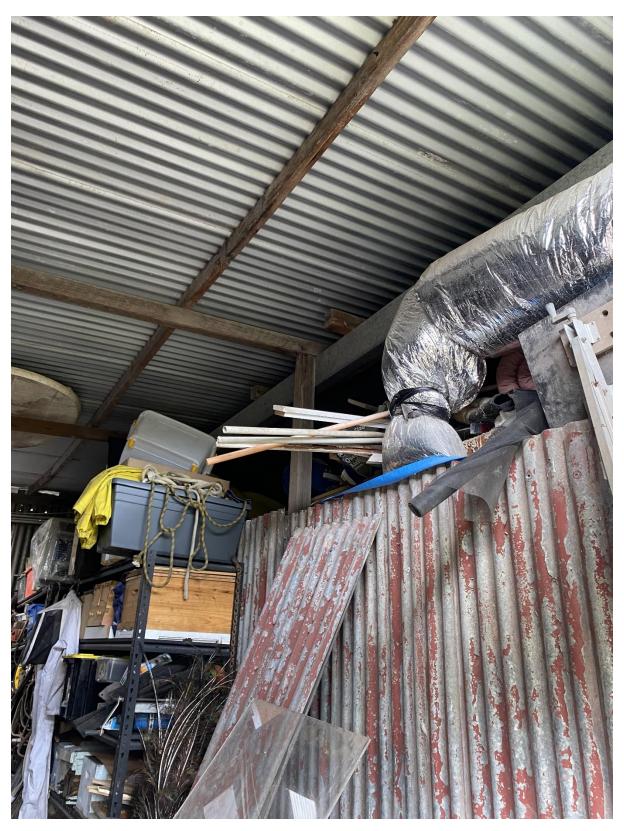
Shed structure entry roof. Rafters spacing too large.
